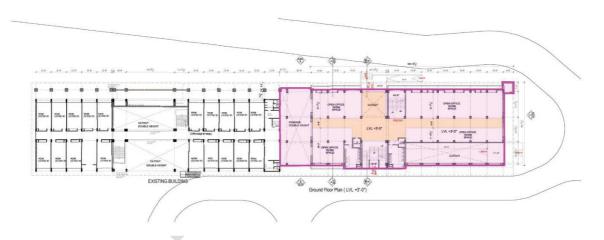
Proposed Plan of Block-3 with red indicating the modification/extension to the existing building; Green indicates the new block Ground Floor © Satnam Namita and Associates
